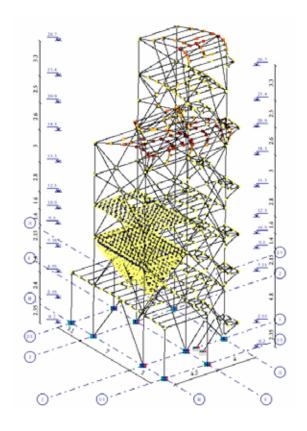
Forms of natural vibrations of the working tower structure with steel beams and corrugated metal decking
